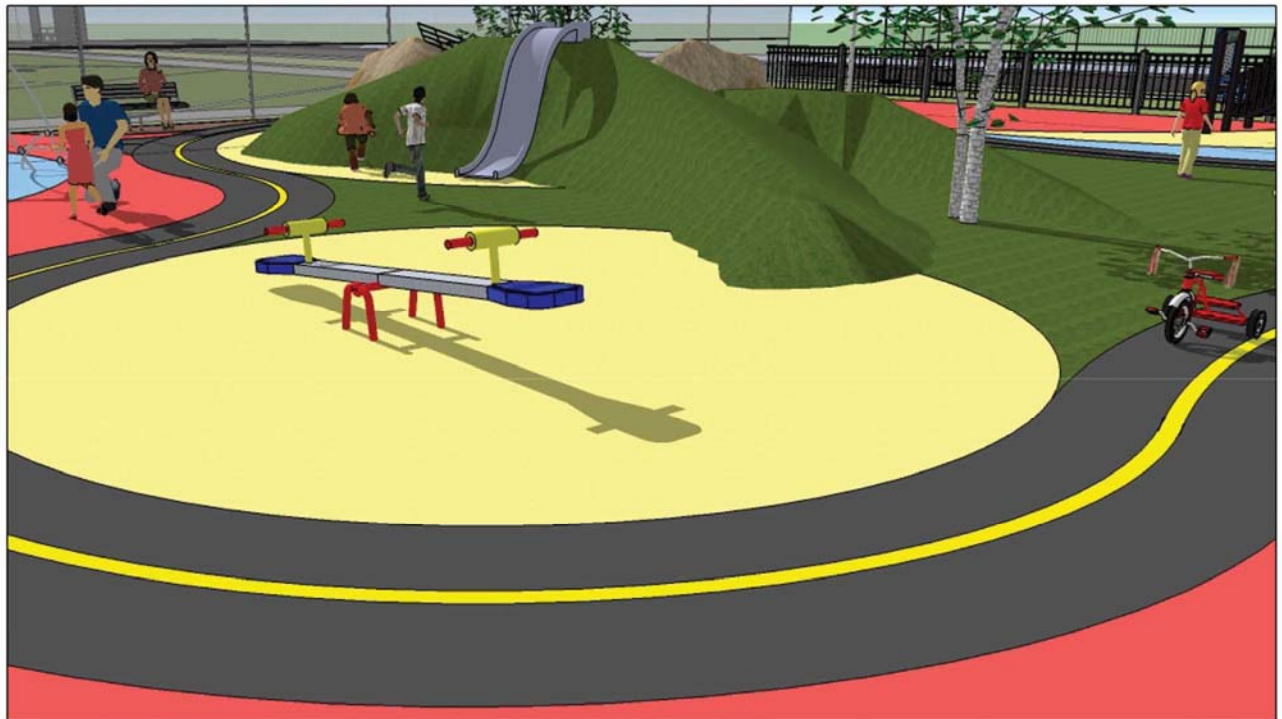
EXHIBIT- F: PERSPECTIVE VIEW OF PLAY AREA ENTRANCE FROM SE CORNER
